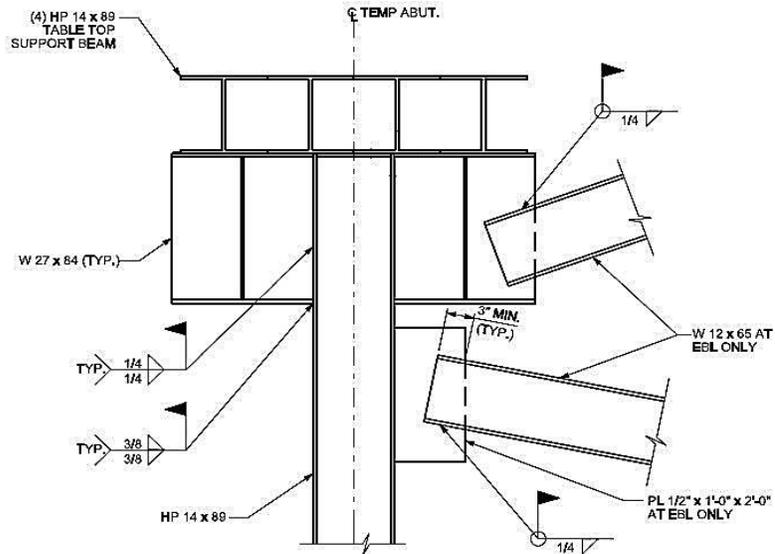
End view of the I-80 Summit Park EB bridge temporary substructure
